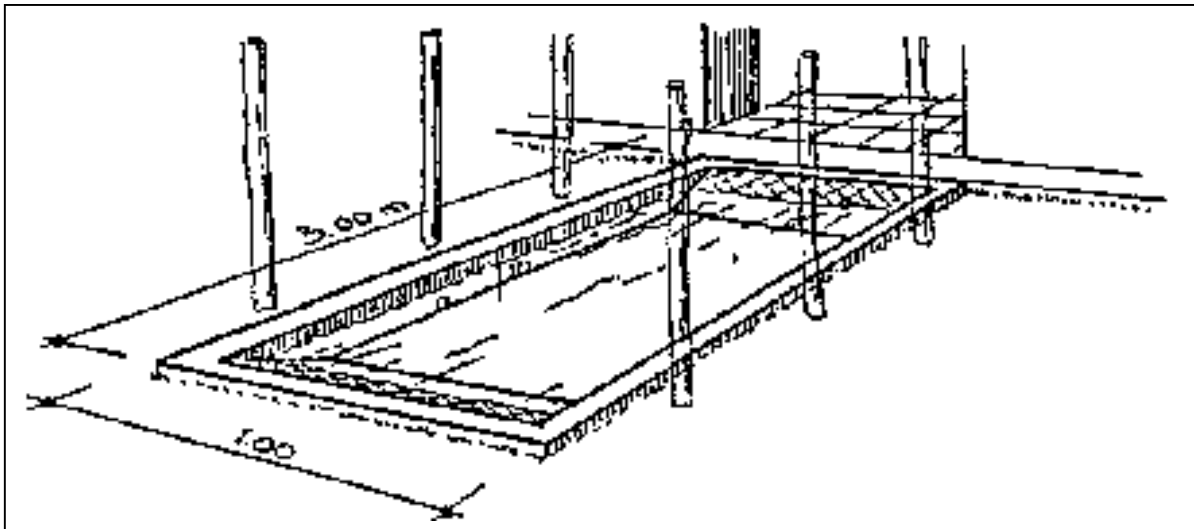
Cattle foot bath. If cattle are regularly out grazing, they should pass a cleaning foot bath before entering the stable in order to prevent too much soil from entering the gasplant. A drainage pipe would allow easier cleaning.
